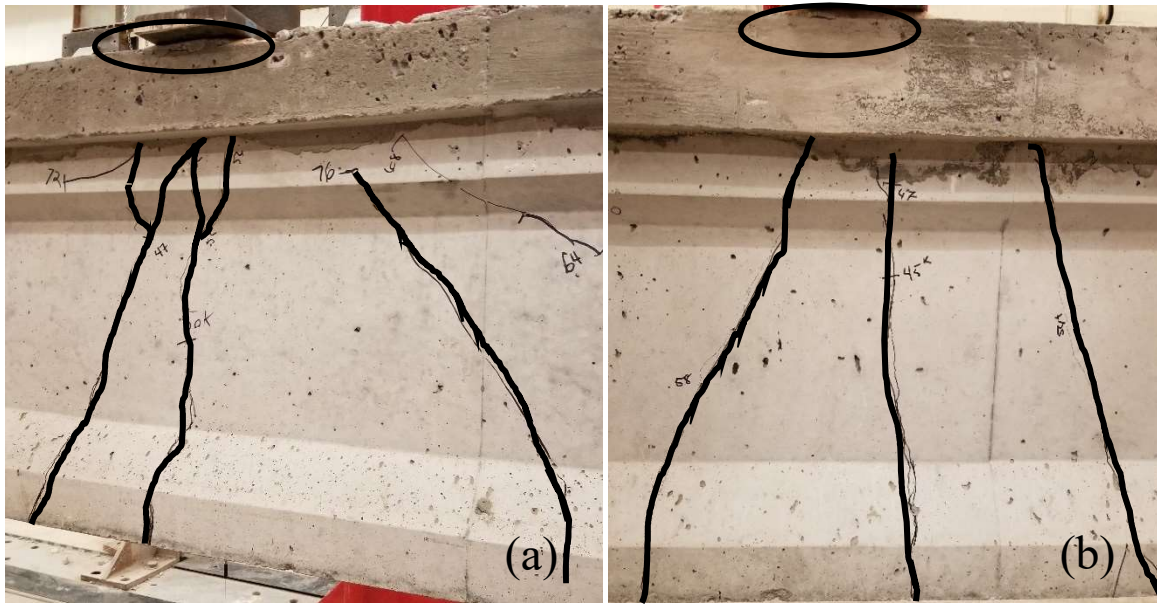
Crushed deck concrete in the RC1-N (a) and RC1-S (b) girders is indicated by a black oval, and the final flexural cracking under the load point in the RC1-N (a) and RC1-S (b) girders is indicated by dark lines.
